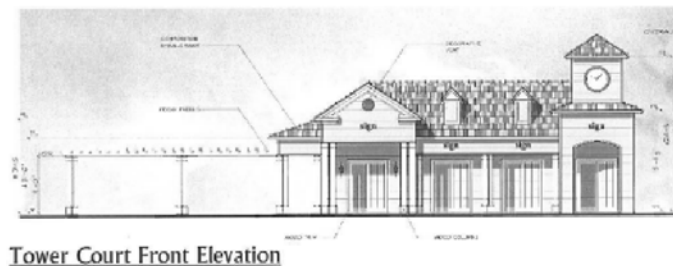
PLATE VIII – TOWER COURT ARCHITECTURE (EXAMPLE)
